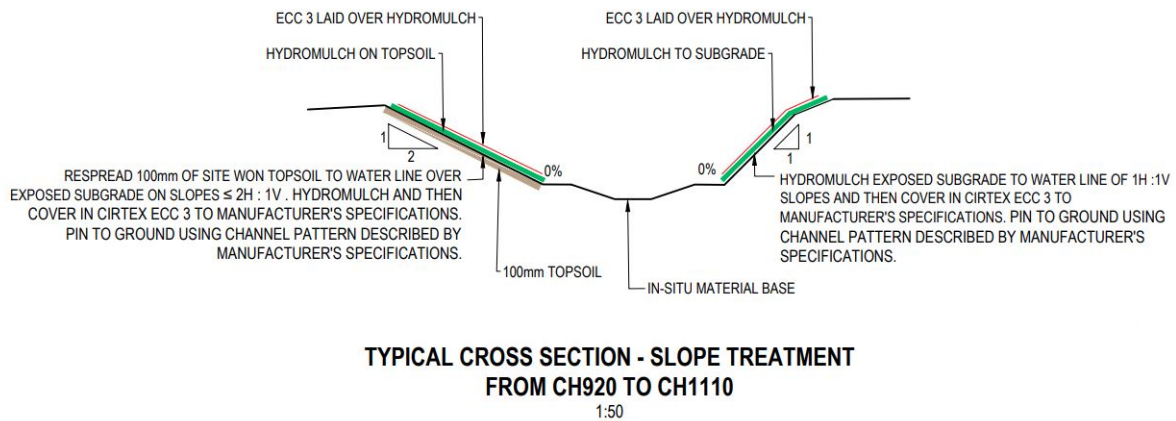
Typical Bypass Cross Section - Downstream Channel.
